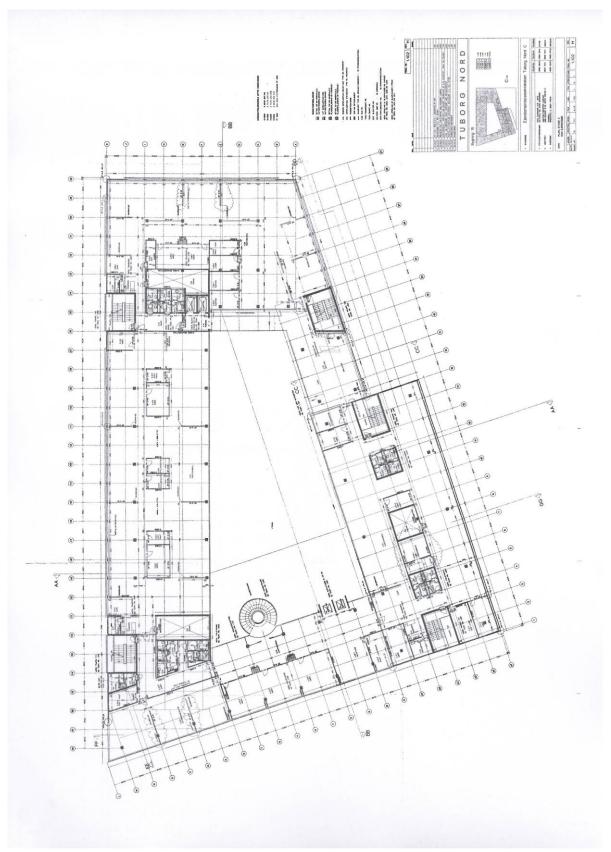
Example of floor plan with open-plan offices and few smaller offices and meeting rooms.
